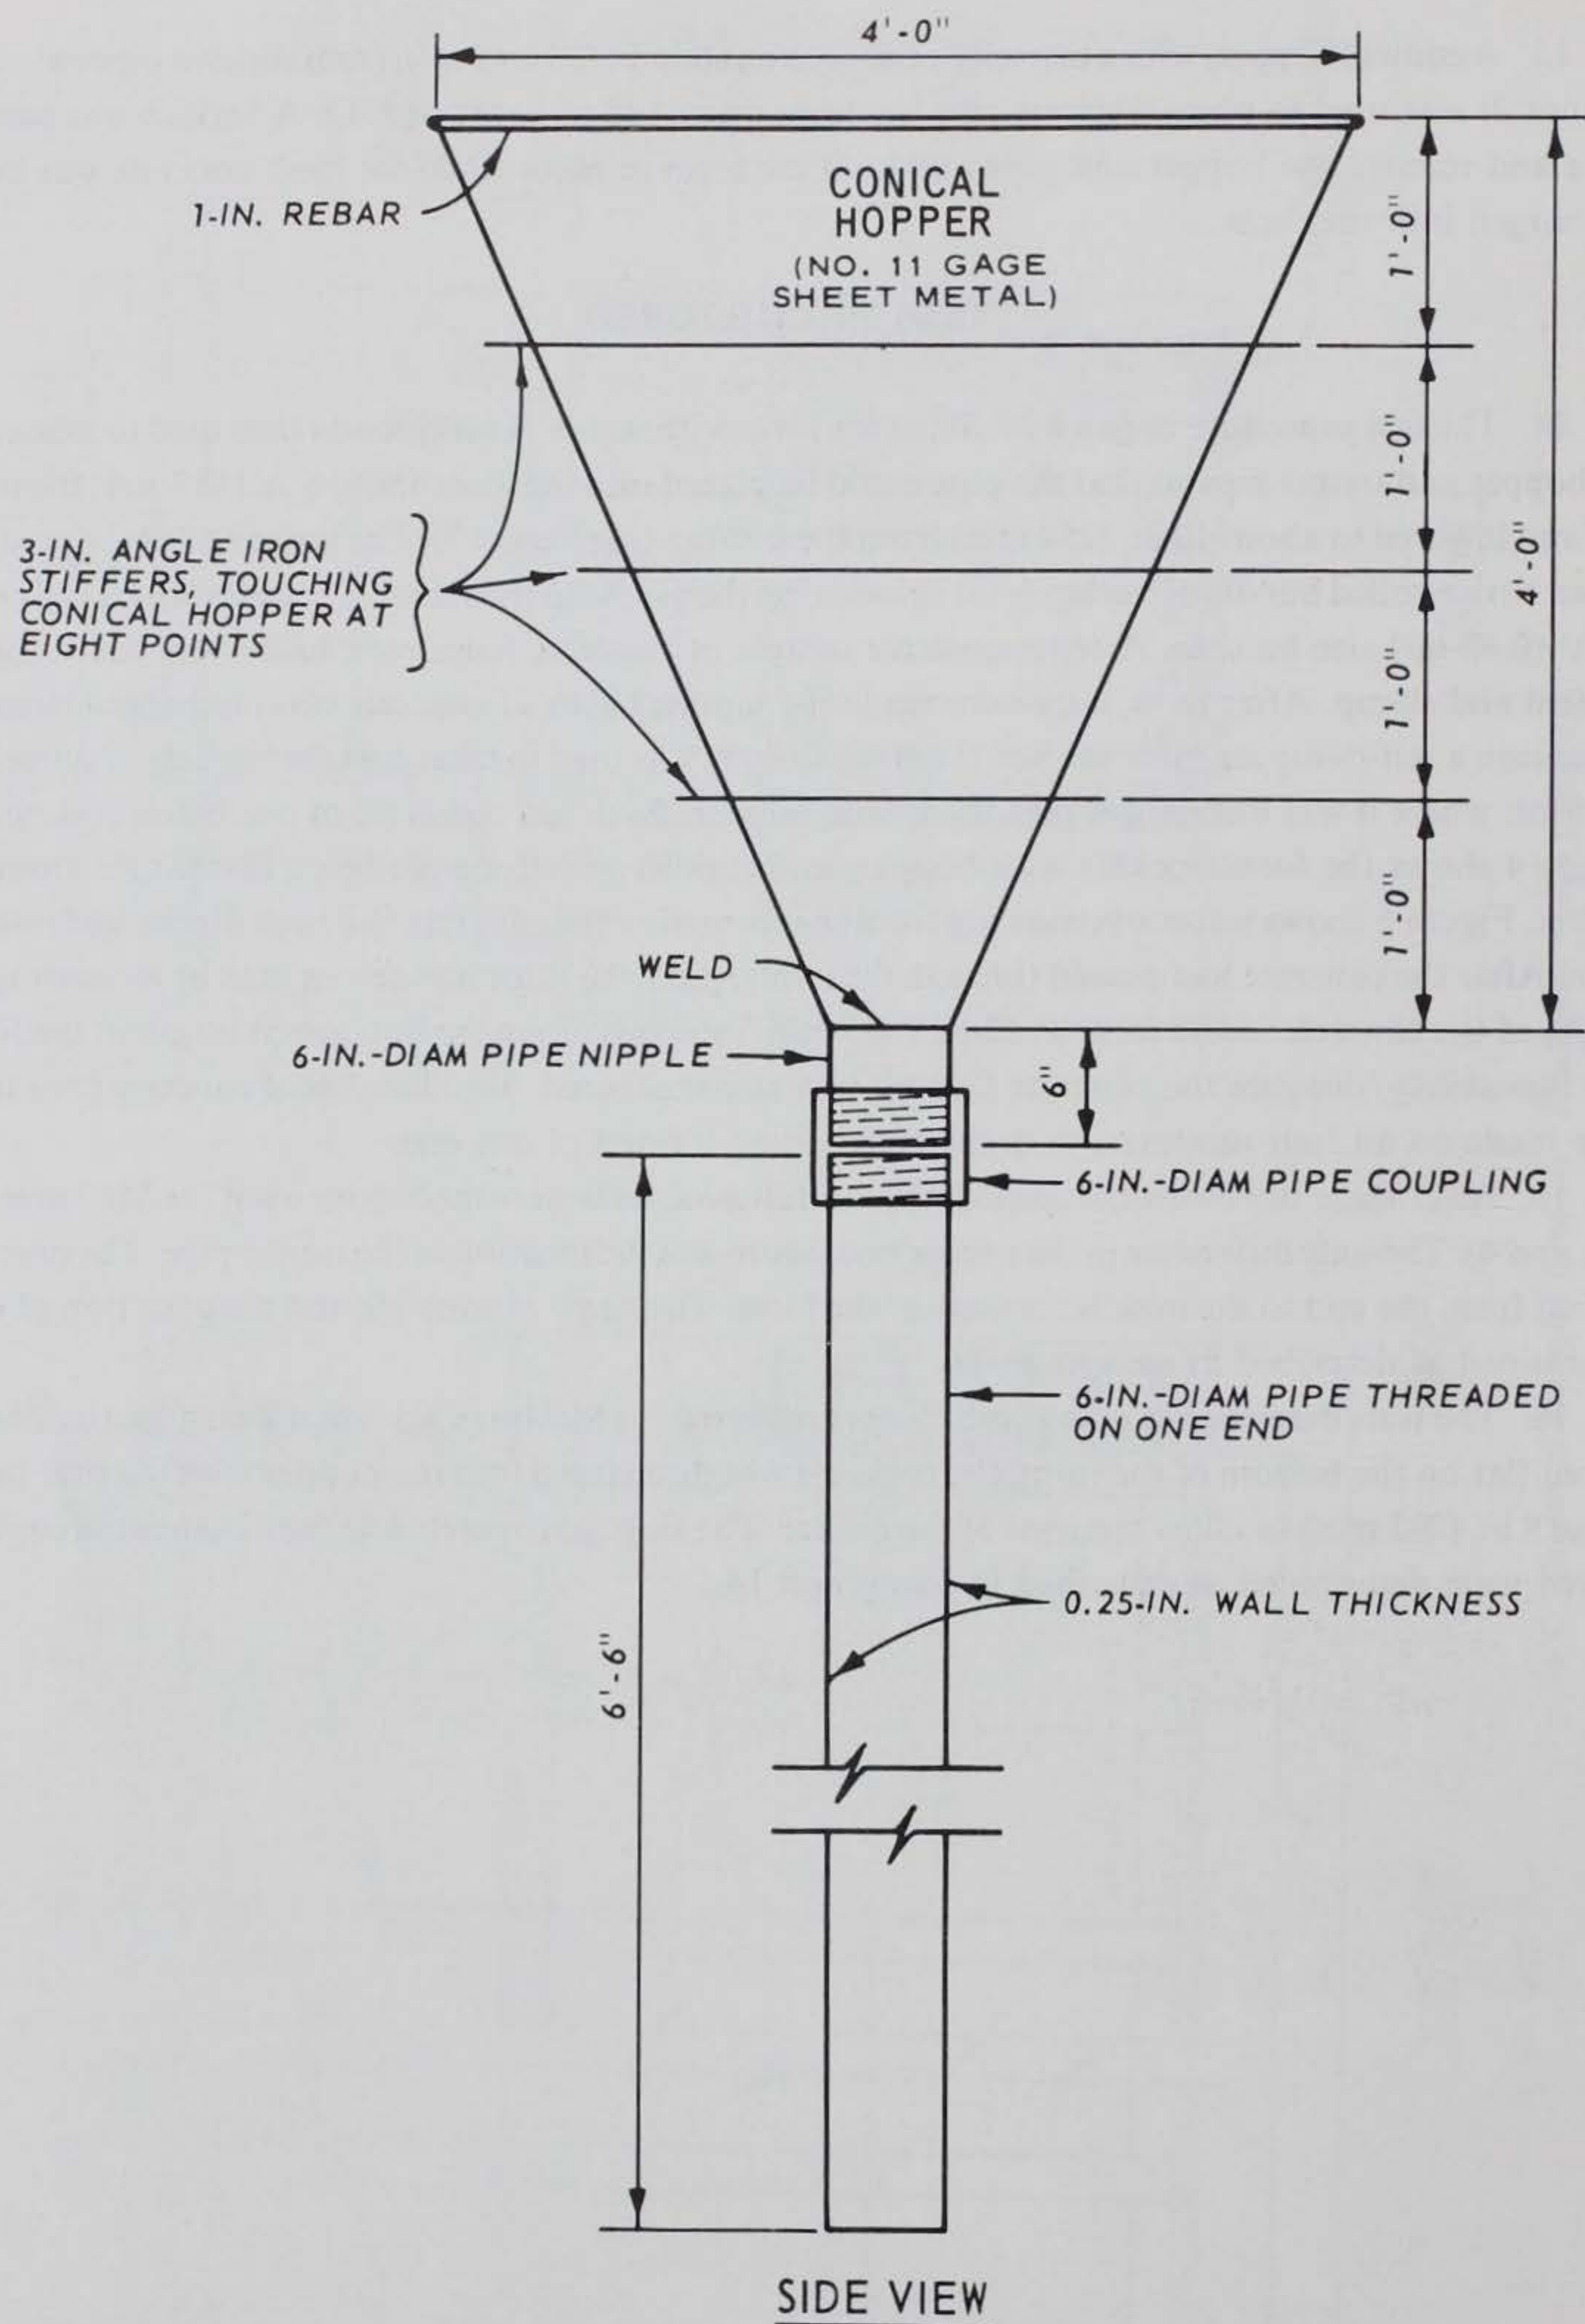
Sketch of conical hopper and pipe for placing concrete underwater
